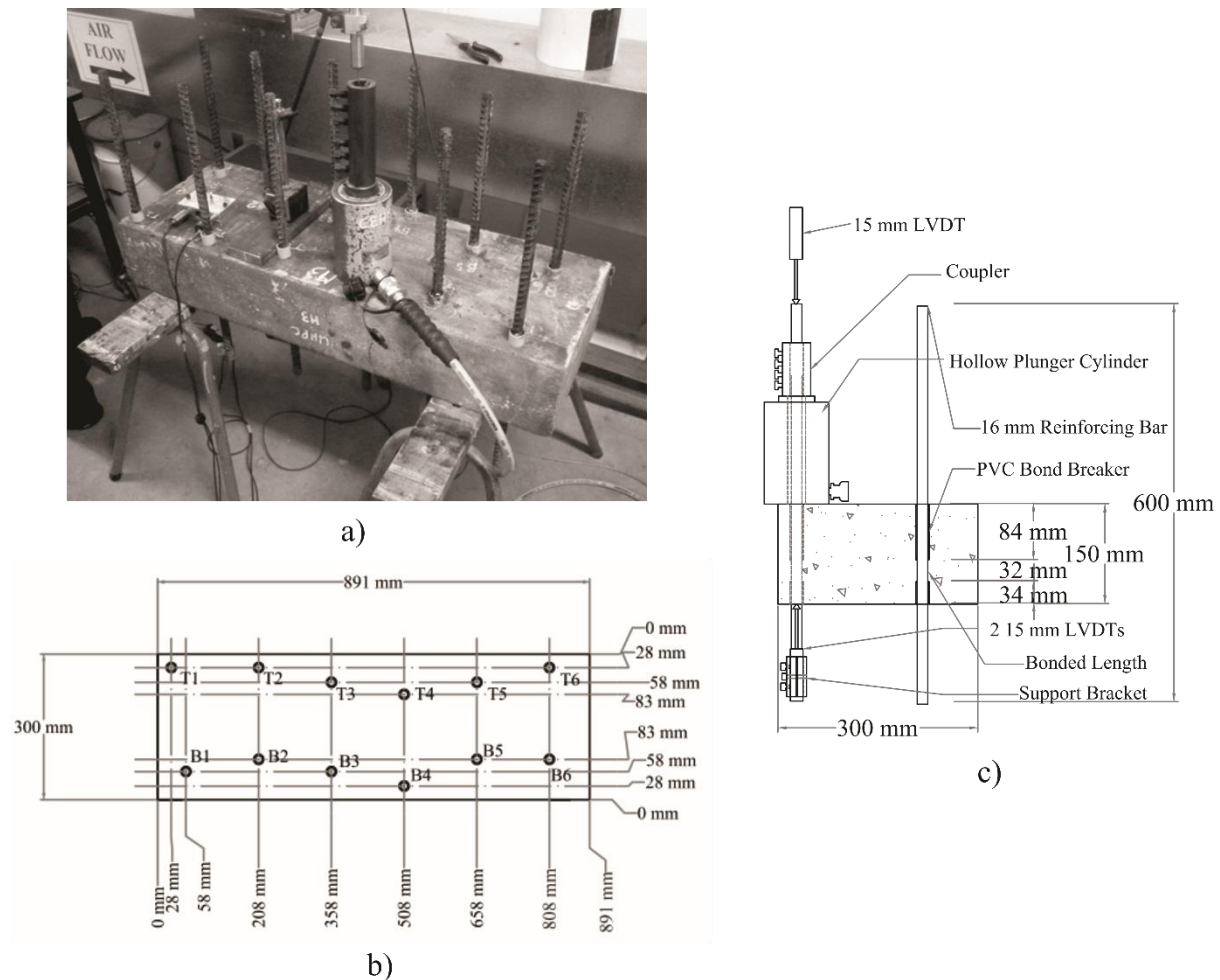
a) Photograph of Test Setup; b) Plan view of specimen; c) elevation through specimen
